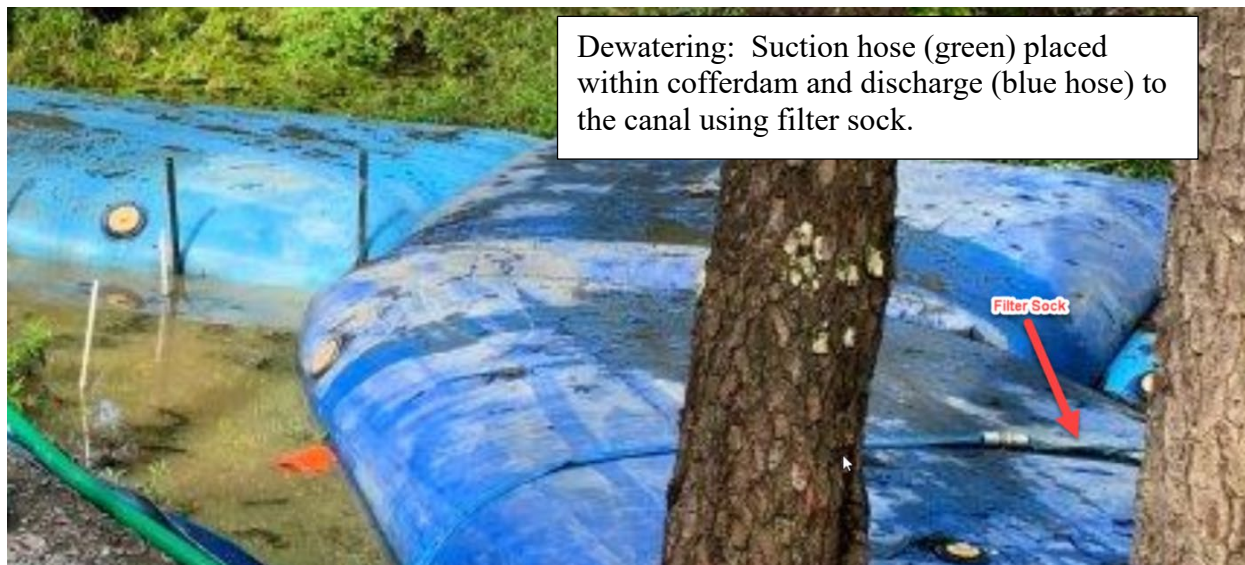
Dewatering of Excavation Area and Treatment of Sediments
